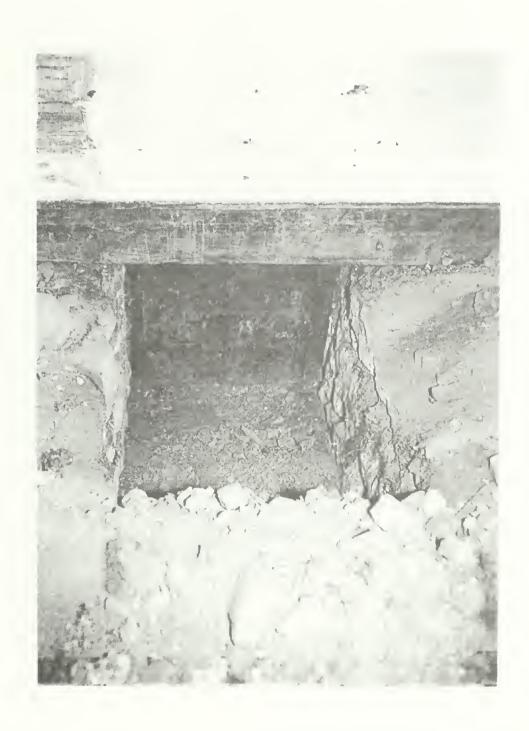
Schuyler House: West façade, opening O001 with original whitewashed areaway (1958).
